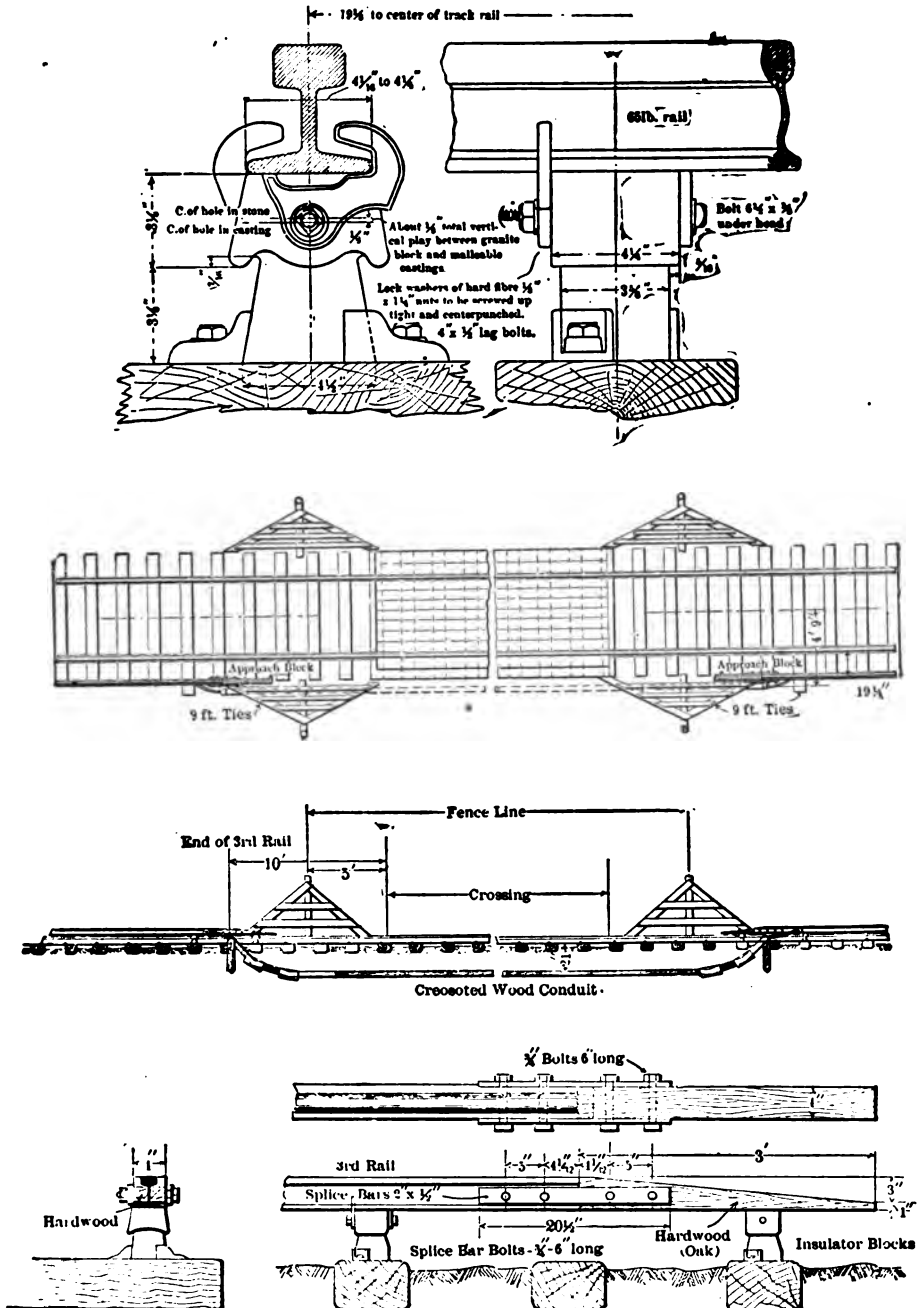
Details of Third-Rail Construction, showing Third-Rail Insulating Support, Highway Crossing, and Approach Blocks.
